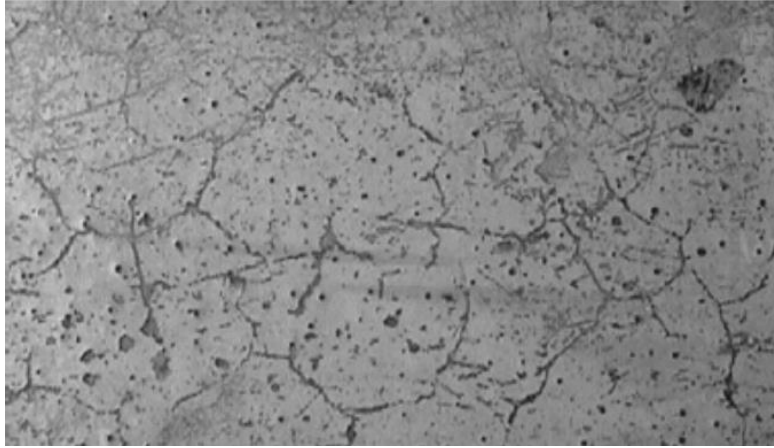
Plastic shrinkage cracking in freshly placed concrete (Mehta and Monteiro, 2014)
